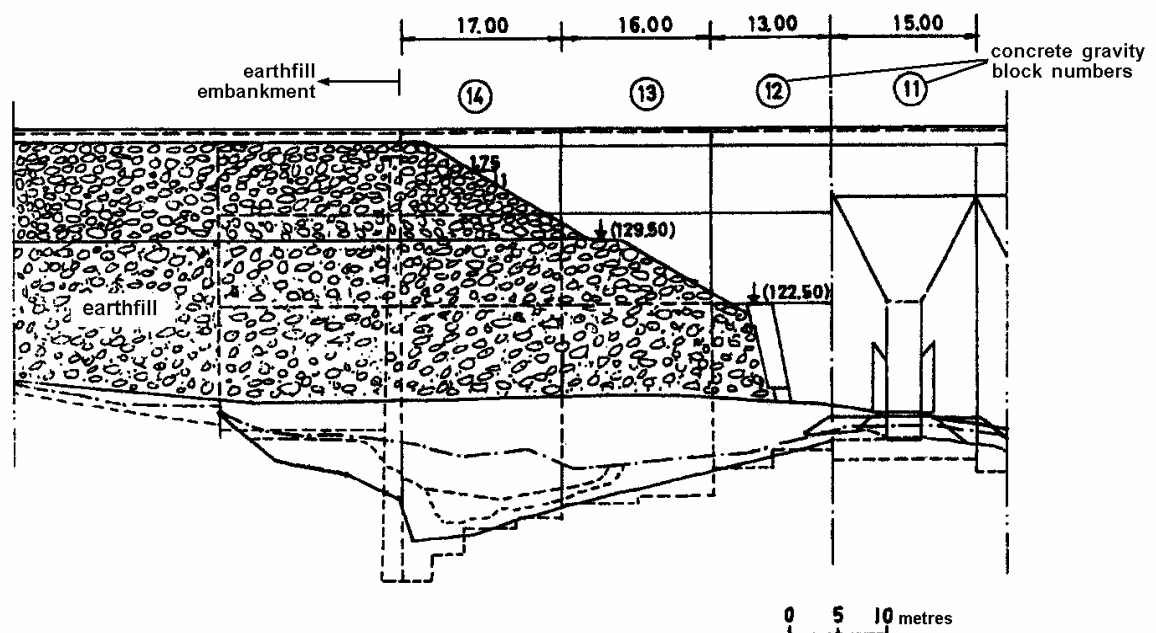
Roxo dam, junction between earthfill and concrete gravity embankment sections on the right abutment (De Melo and Direito 1982).
